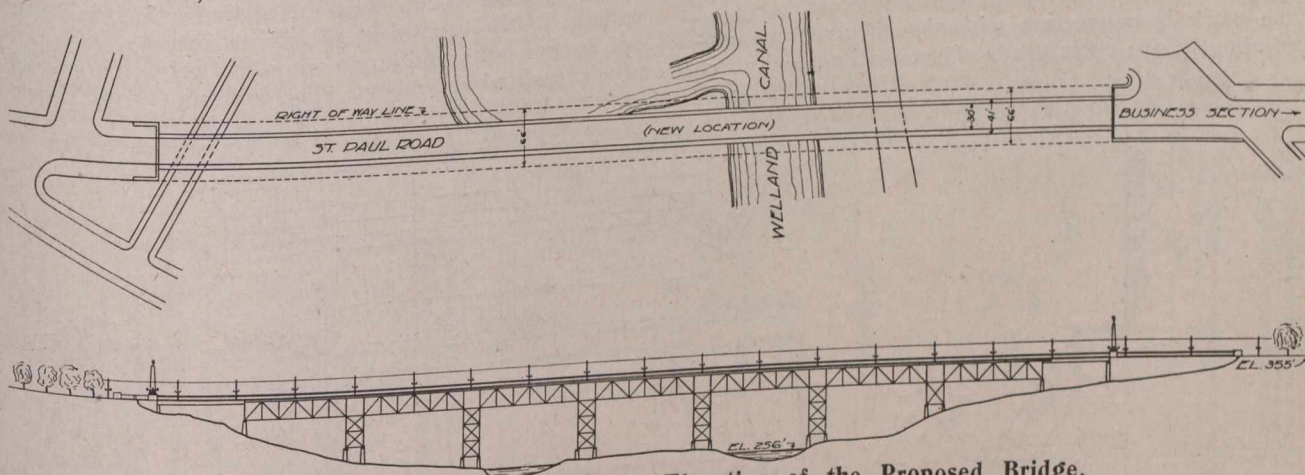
General Plan and Elevation of the Proposed Bridge.
